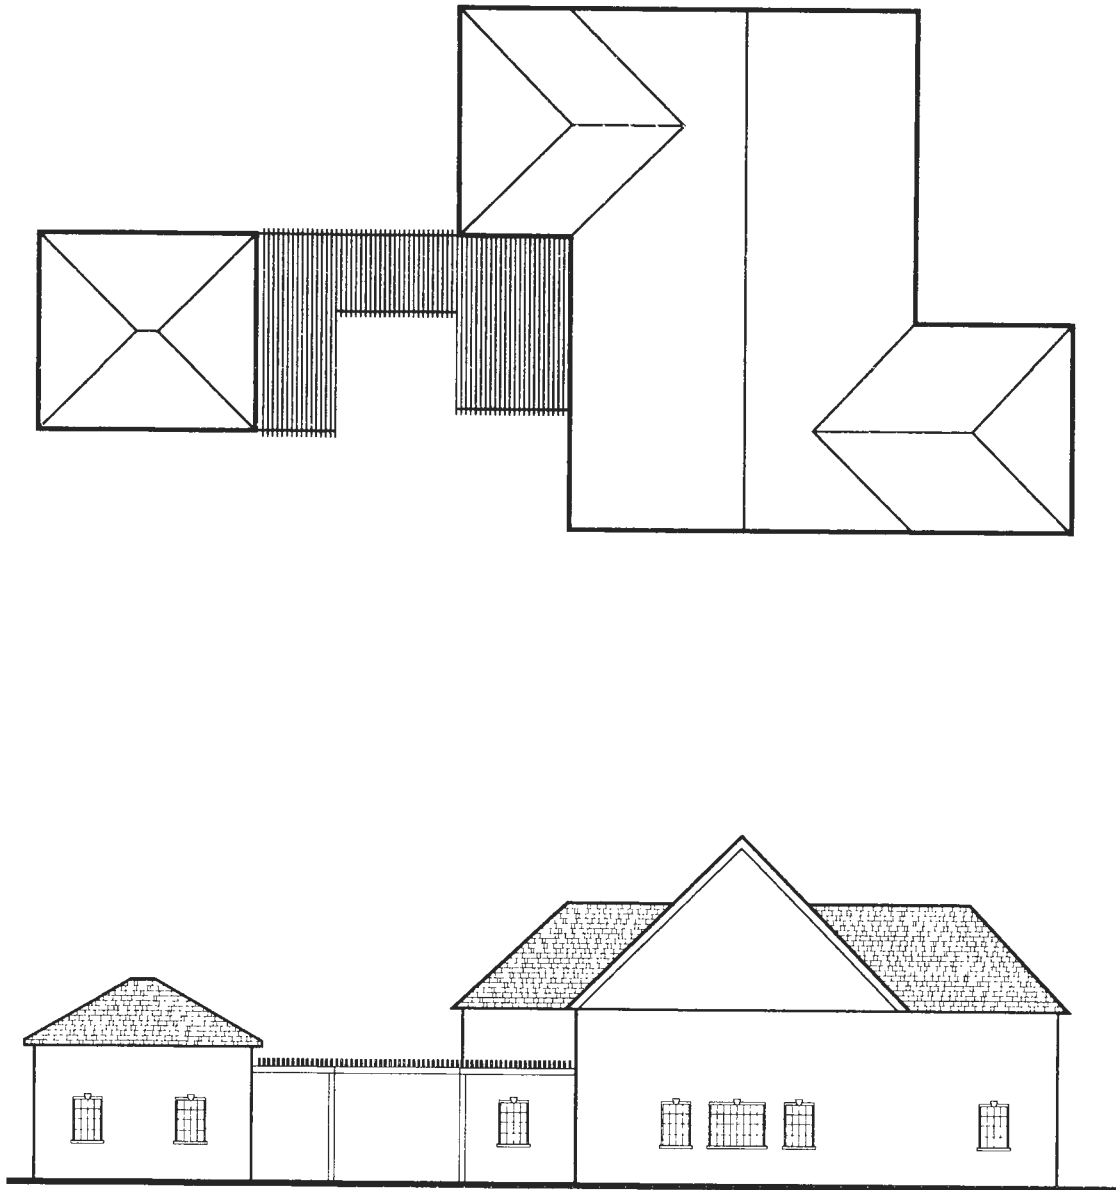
Using overhead planes to connect buildings provides an unobtrusive link while creating an enclosed space beneath the overhead that can be utilized for more than just passage.
